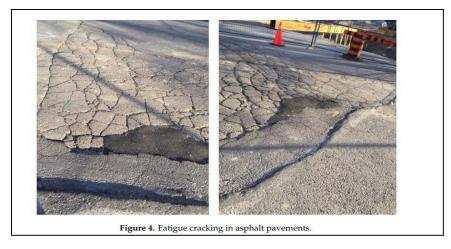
Fatigue cracking in asphalt pavements
